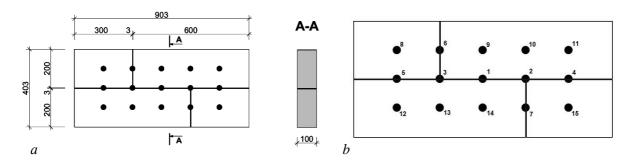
Shape of test masonry specimens (a) and drilling order (b)
